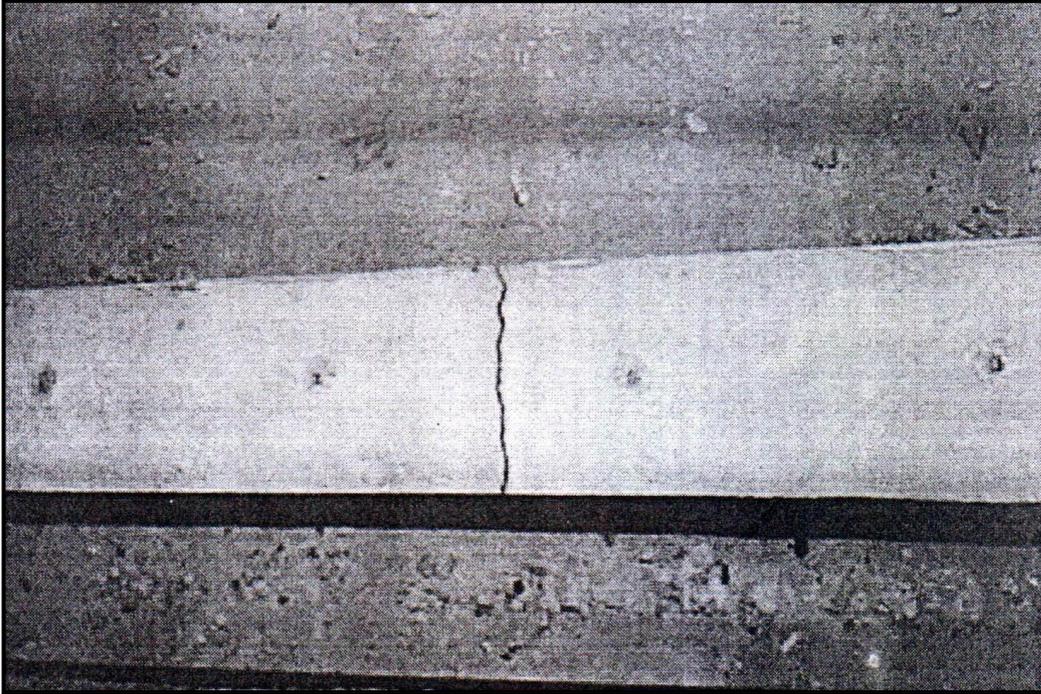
The Crack Location in Specimen (BM_{4.9})
